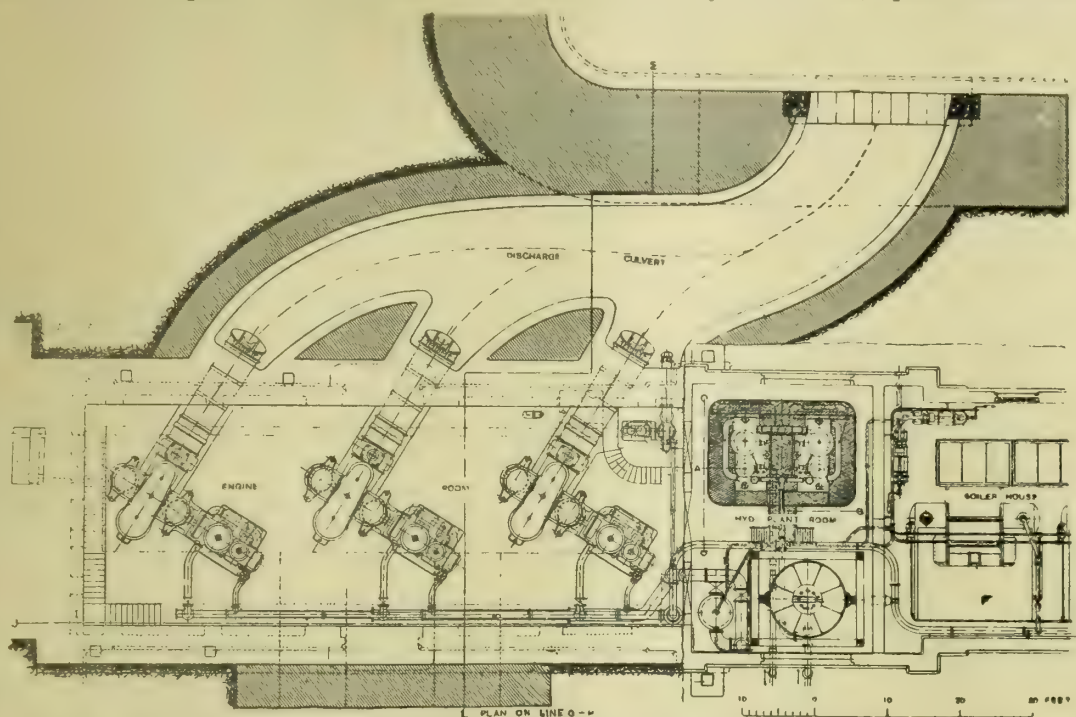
MACHINERY FOR EMPTYING THE DOCK. NEW ENGINE ROOM, HYDRAULIC PLANT ROOM, AND PART OF BOILER HOUSE.
